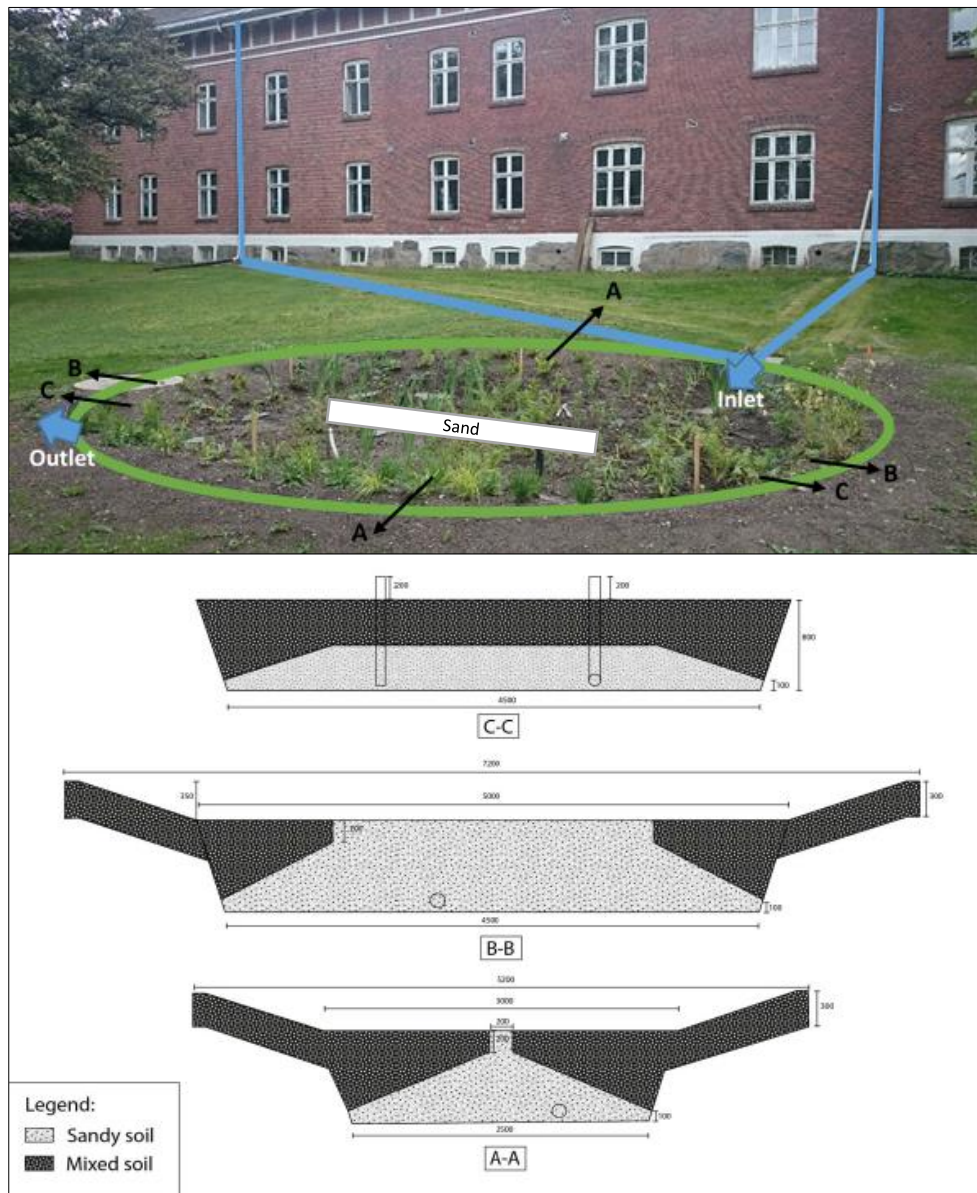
NMBU Raingarden Design: Area, roof drainage pipes and water inlet & outlet. Raingarden dimensions and type of media (Mixed soil and sandy soil). Cross sections: A-A, B-B and C-C
